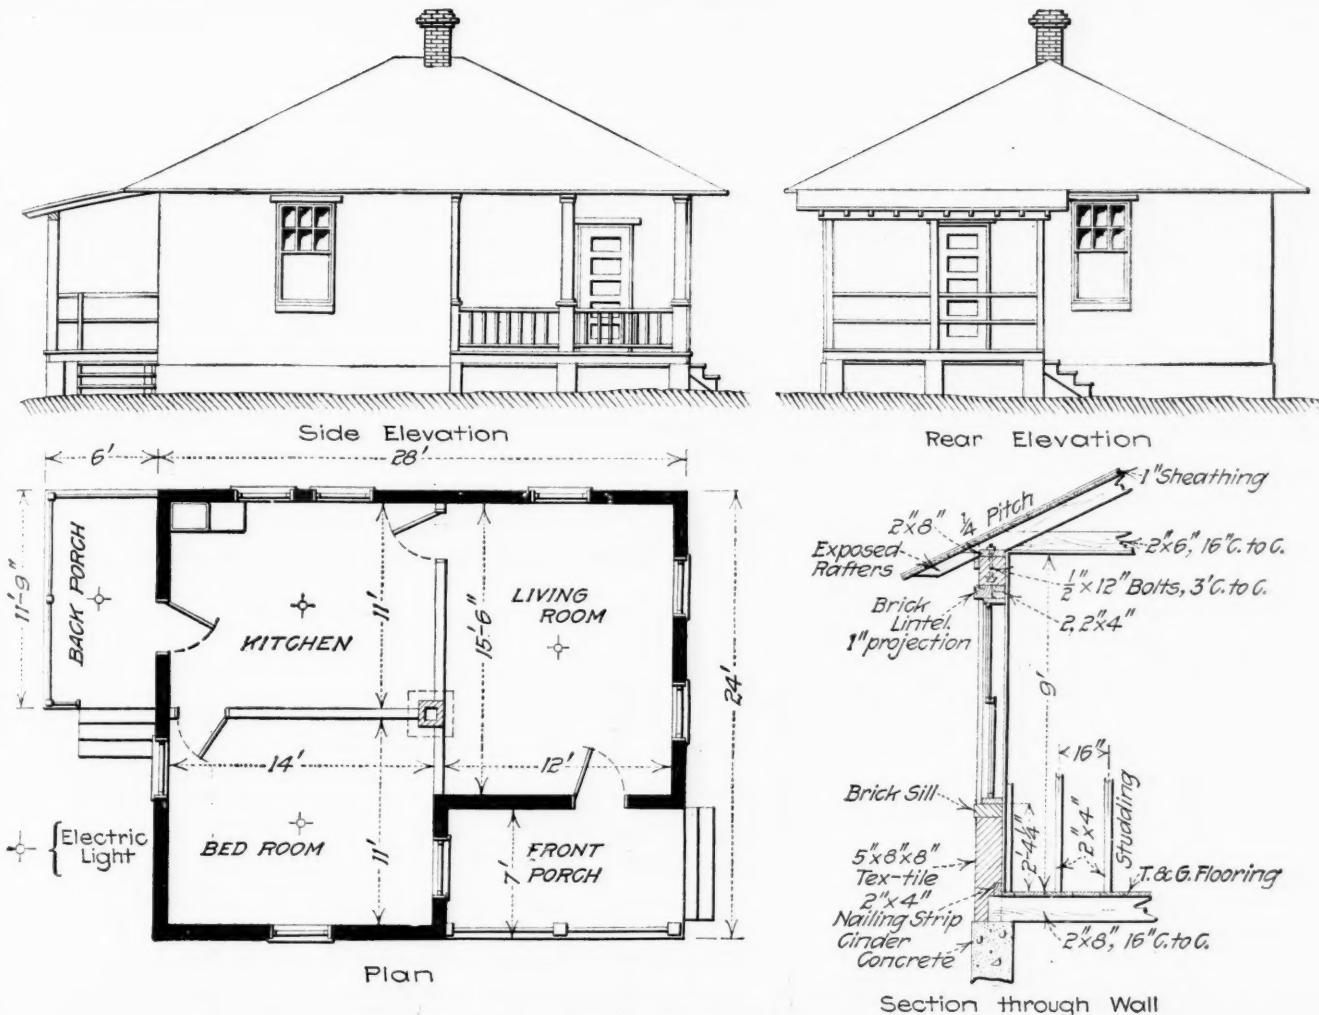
WORKING PLAN OF BUNGALOWS ILLUSTRATED IN FIGS. 1 TO 4
